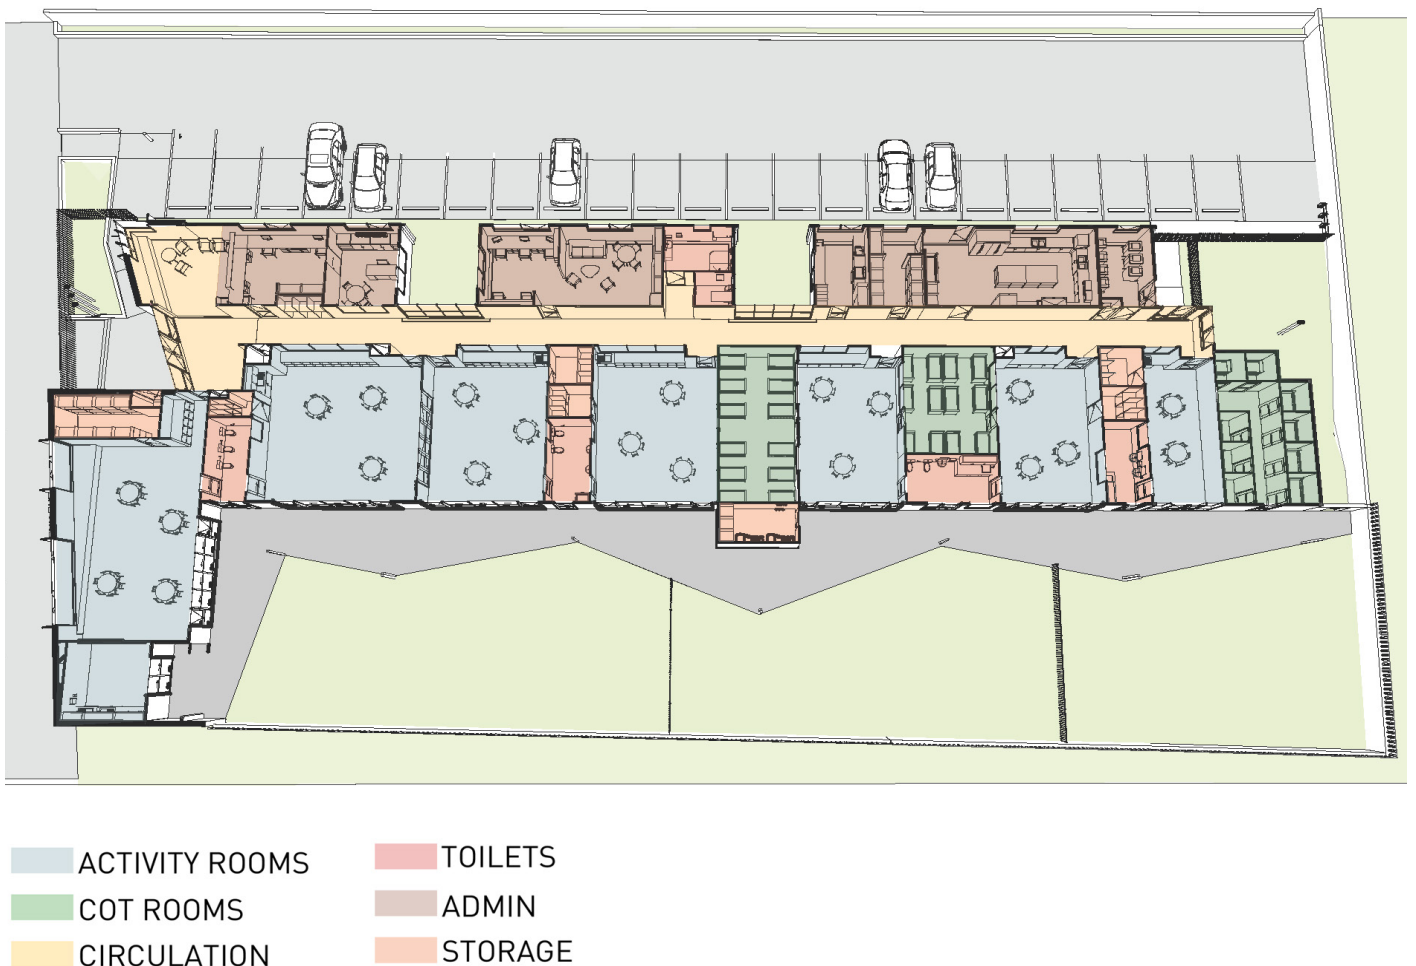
Cutaway plan showing arrangement and relationship between rooms within a child care facility.
